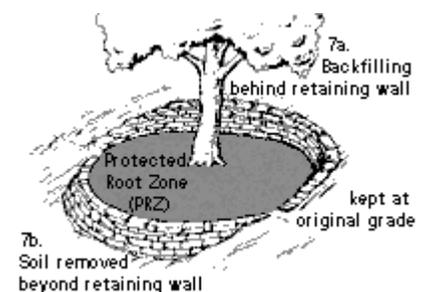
If you change the grade within the root zone, use retaining walls to keep as much of the original grade as possible. *a)* backfilling; *b)* cutting.
